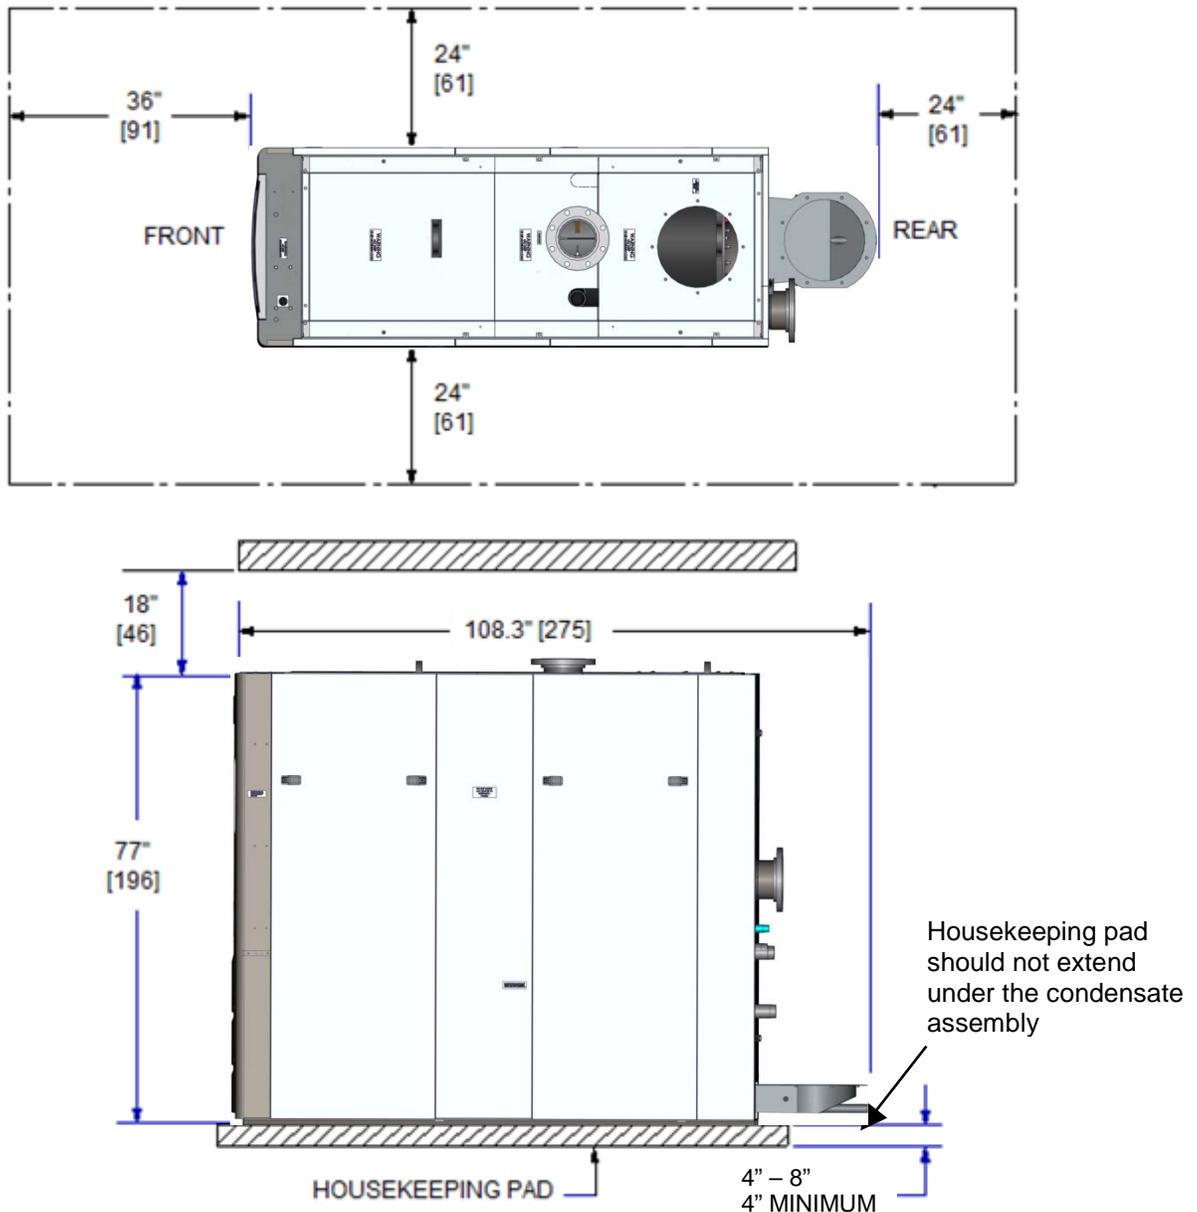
Benchmark Boiler Model 6000 Clearances
